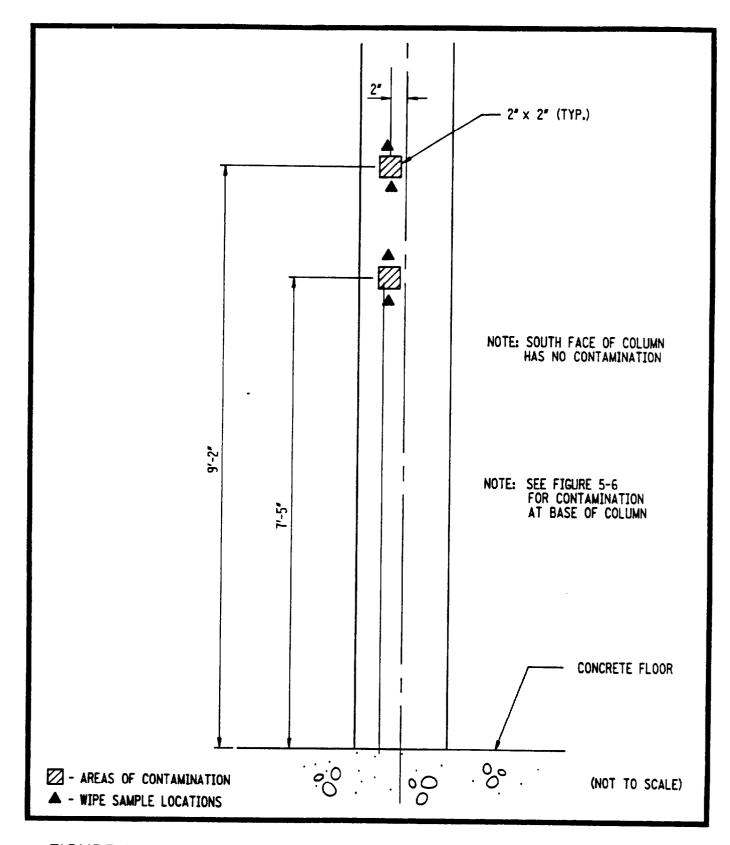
AREAS OF CONTAMINATION — COLUMN 1, NORTH FACE (ROOM 1, FIRST FLOOR)
